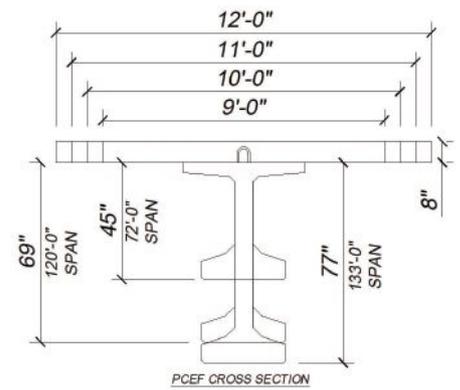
Precast concrete economical fabrication (PCEF) bulb-tee cross sections analyzed in this study. All Figures: JP Binard and AI Patel.
